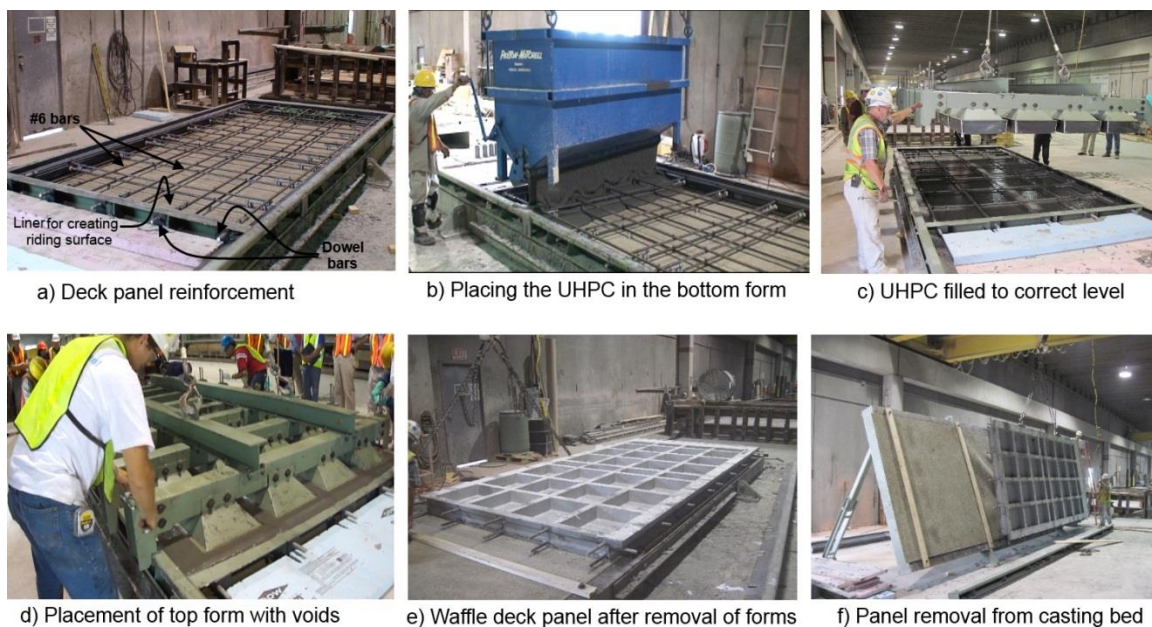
Construction of the UHPC waffle deck panel for the demonstration bridge
